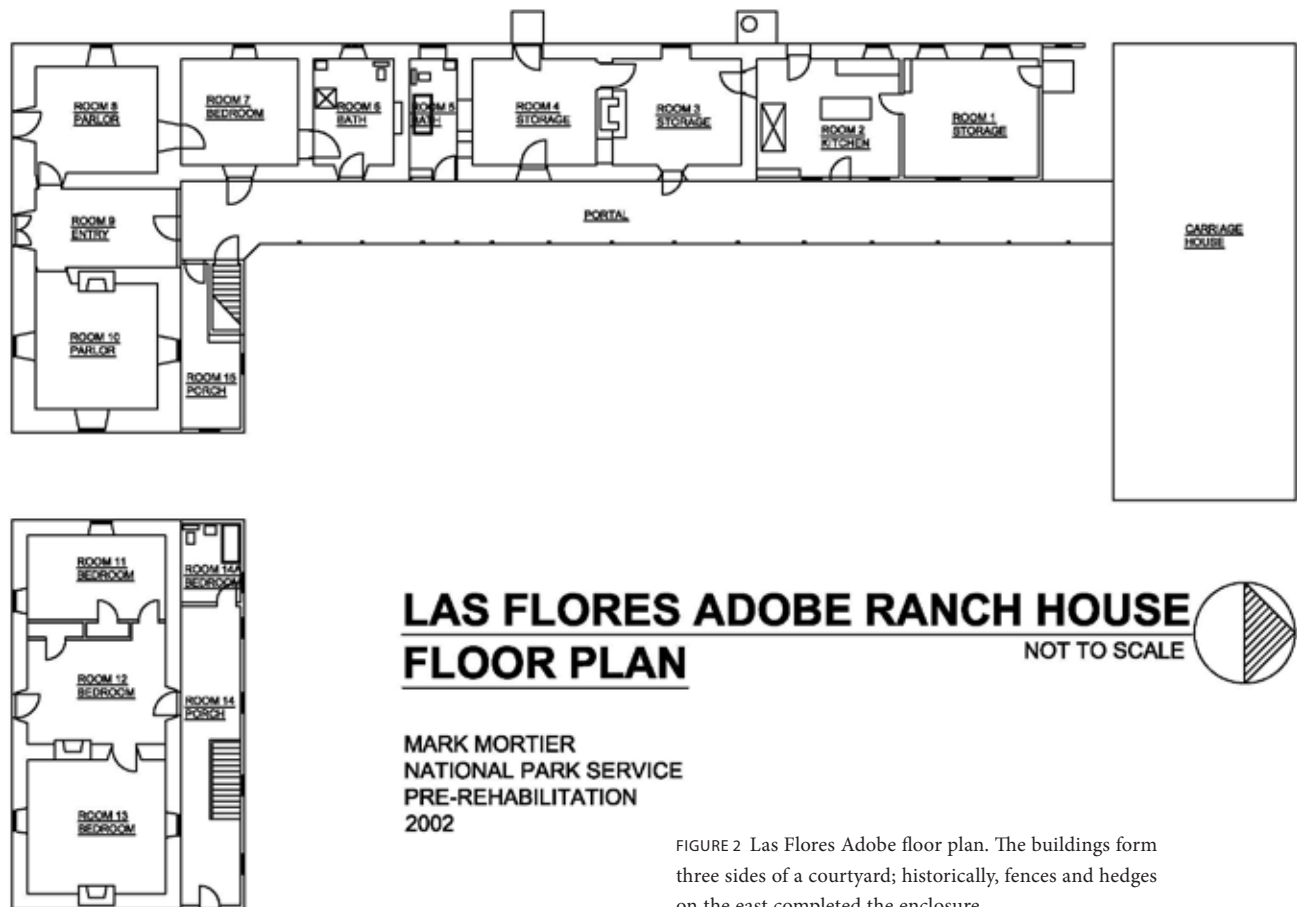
Las Flores Adobe floor plan. The buildings form three sides of a courtyard; historically, fences and hedges on the east completed the enclosure.
